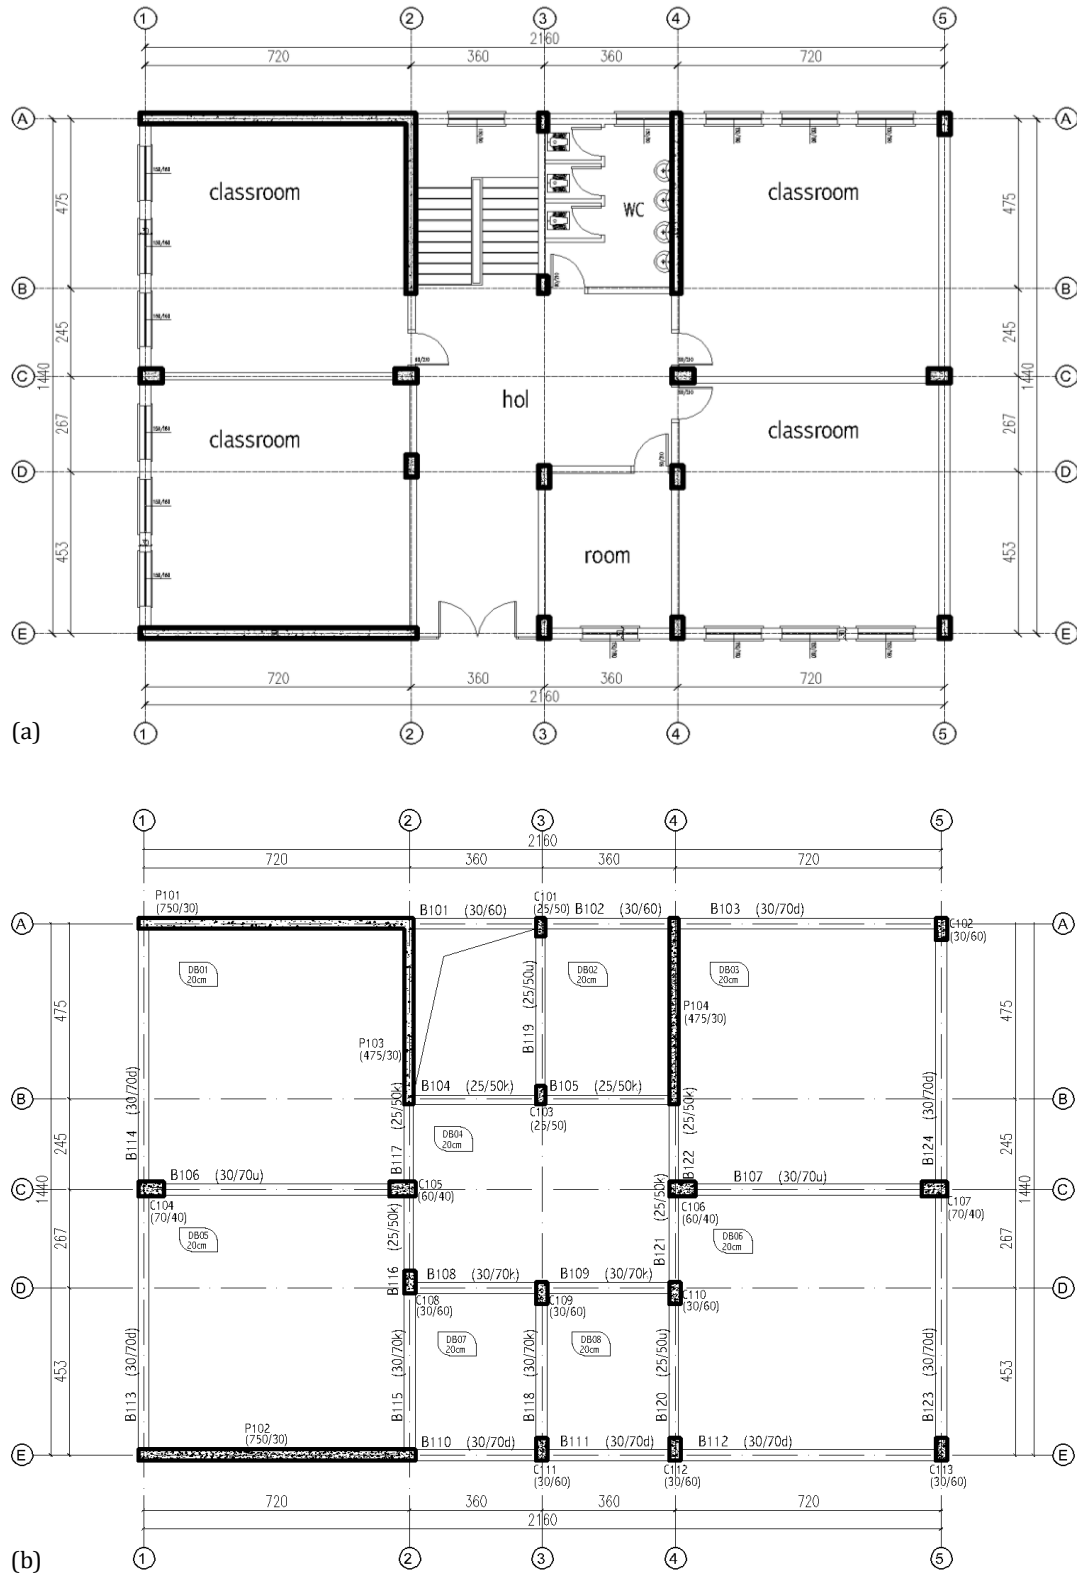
(a) Architectural and (b) Structural floor plans of the collapsed school building.
